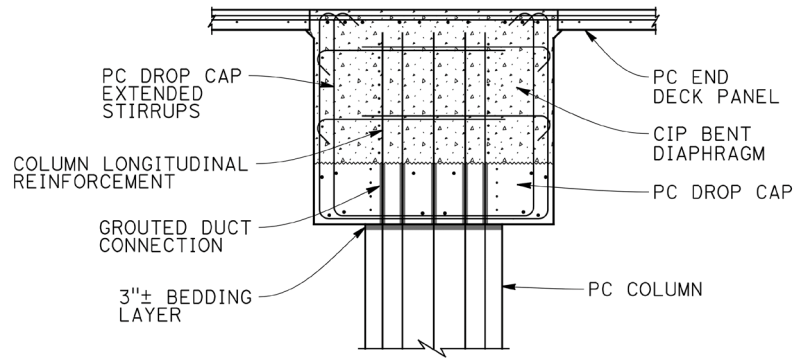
Integral Precast Column to Precast Cap Connection
